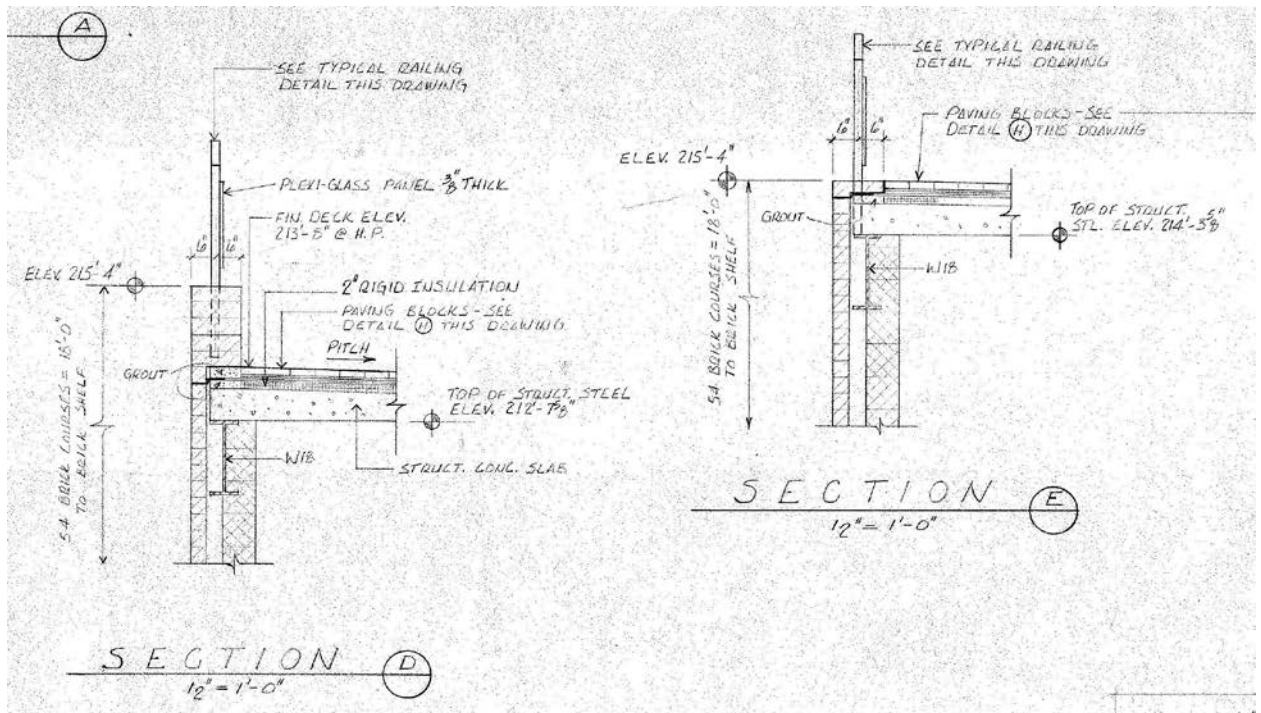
Image J – excerpts of the building’s original design drawings; a throughwall flashing within the wall system was not evident.
